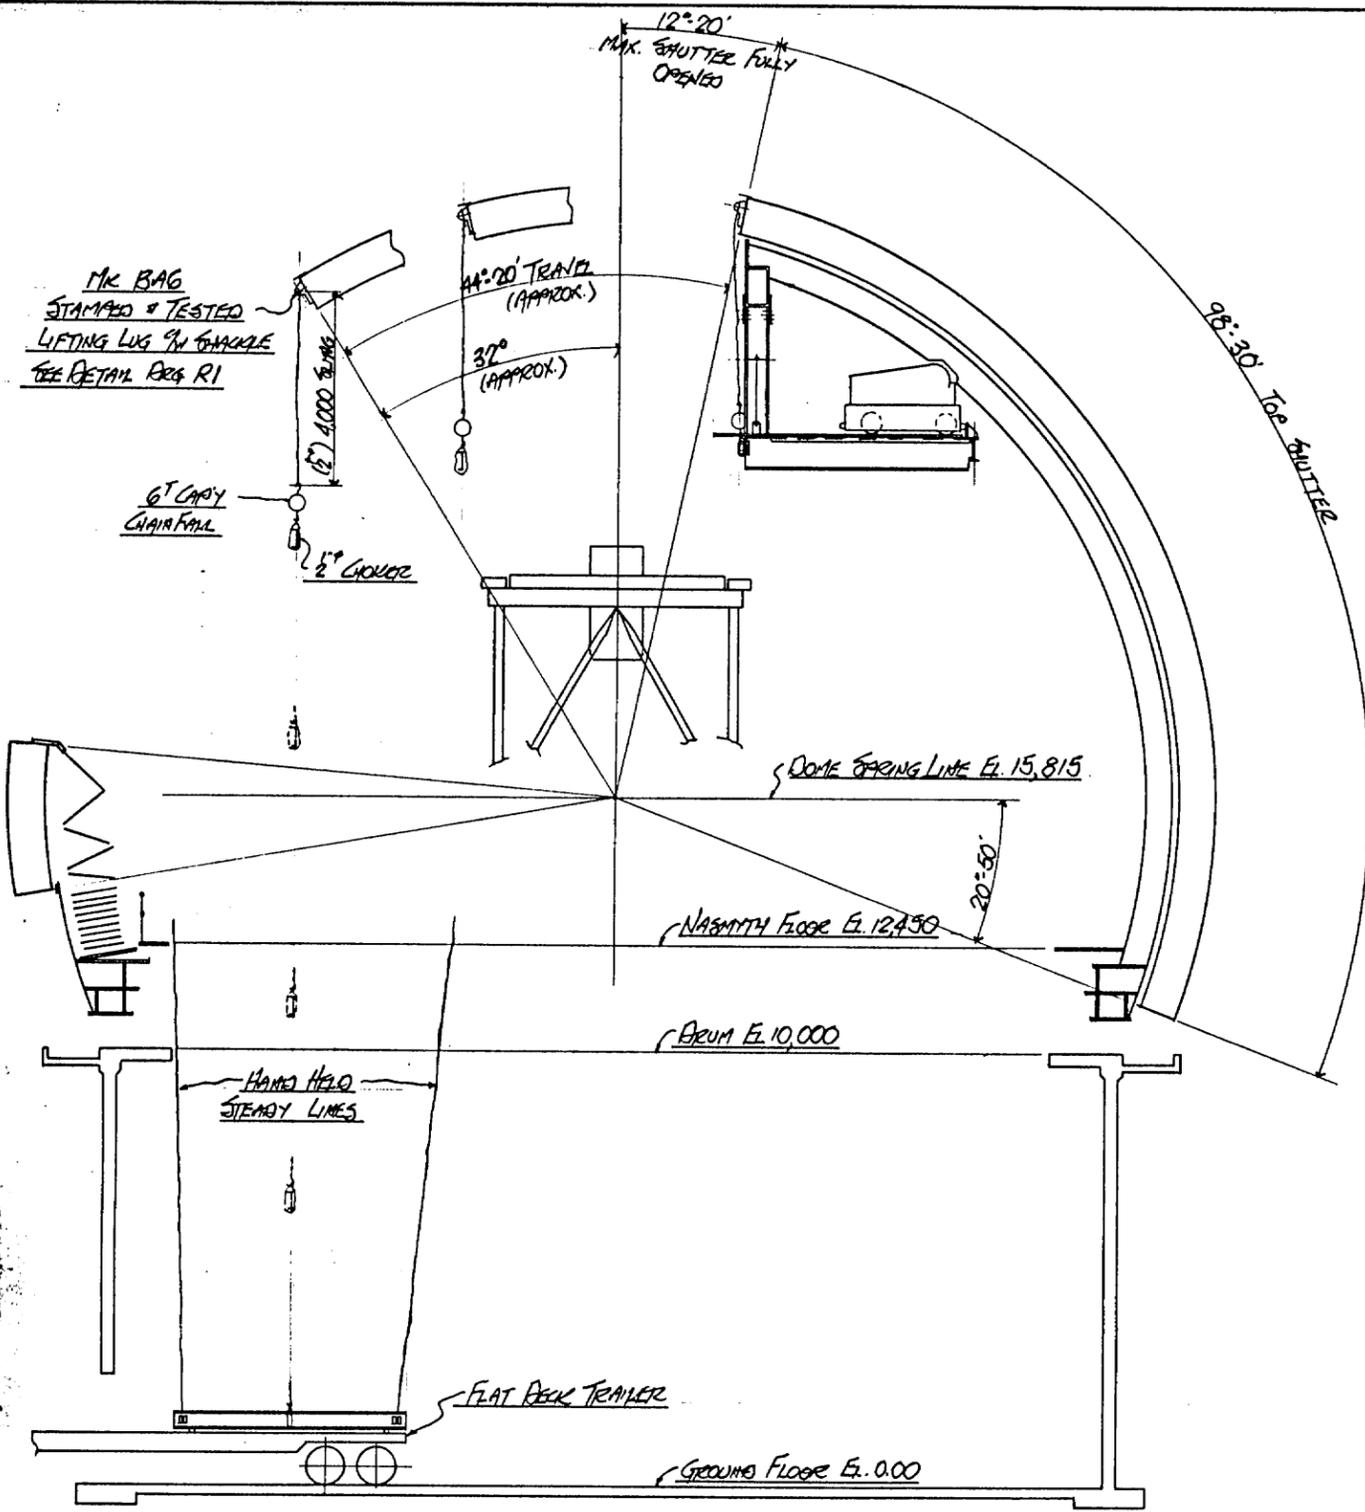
DETAILS OF <b>CRANE GIRDER REMOVAL</b>
